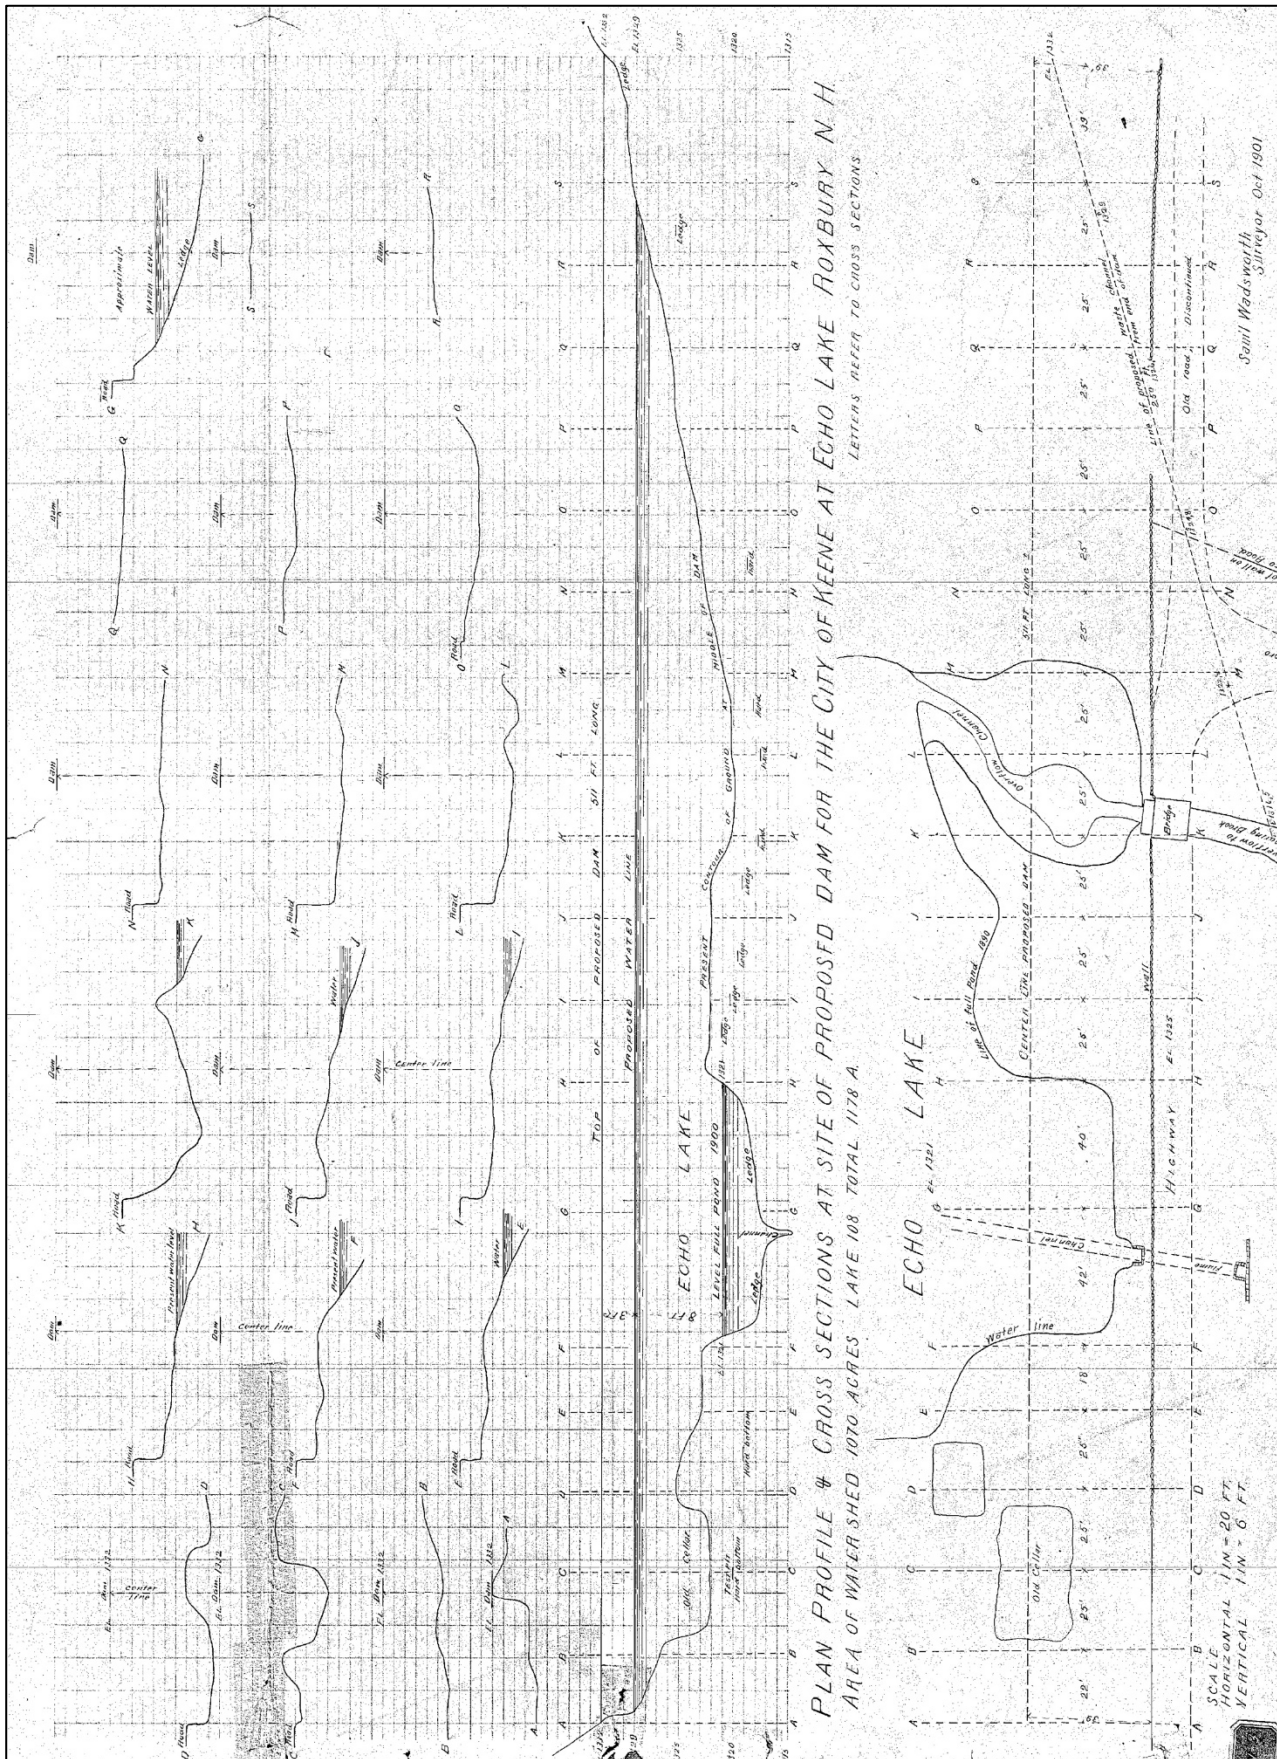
Plan showing then existing dam at Echo Lake (Source: Wadsworth 1901).
